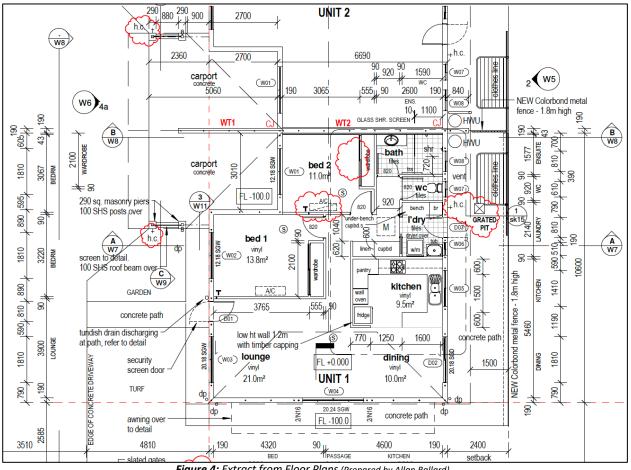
Extract from Floor Plans (Prepared by Allan Ballard)
